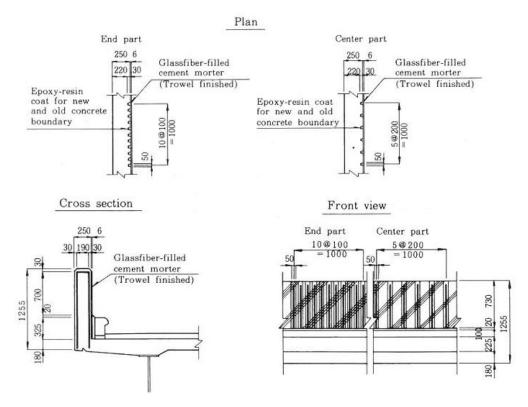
Standard for repair work of exposed bars in railing
